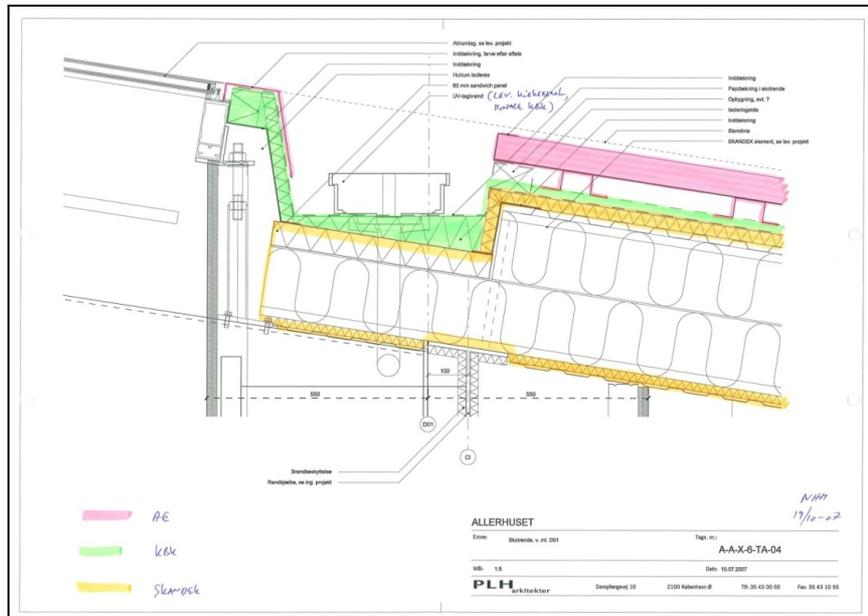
Detail architectural plan of roof construction after it has been coloured with highlighters for coordinative purposes.
